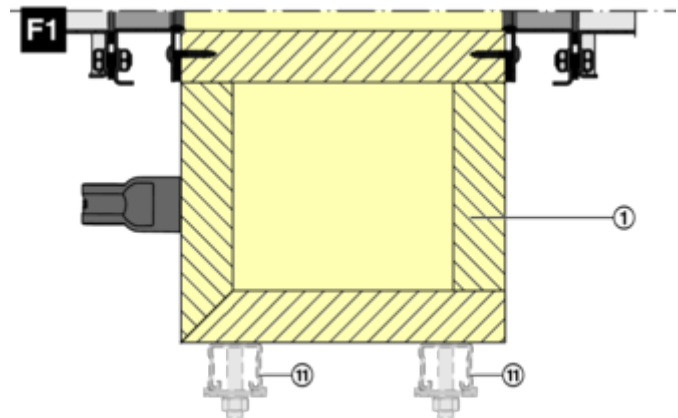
Installation detail F1: Suspension actuator box cover standard
